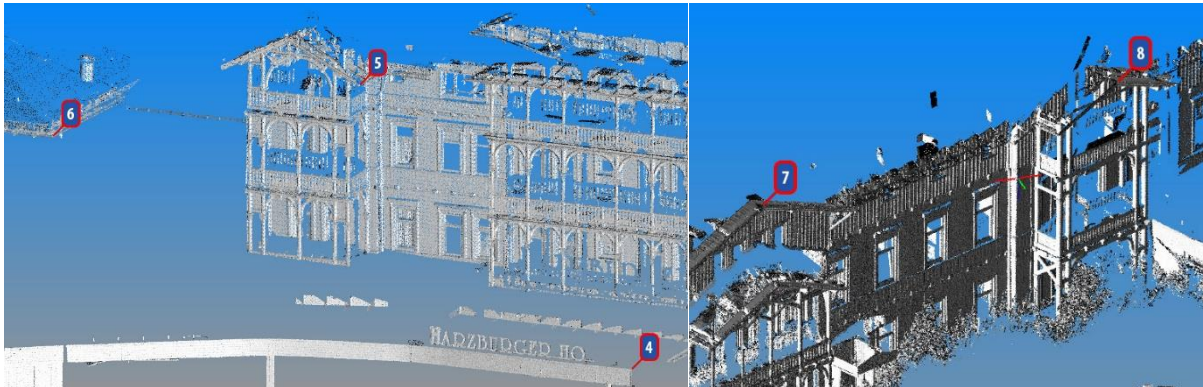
Points 4, 5, 6 on L2. Vertex of garage wall (point 4) and of roof (points 5, 6) (left). Points 7, 8 on L2. Vertices of roofs (right)
